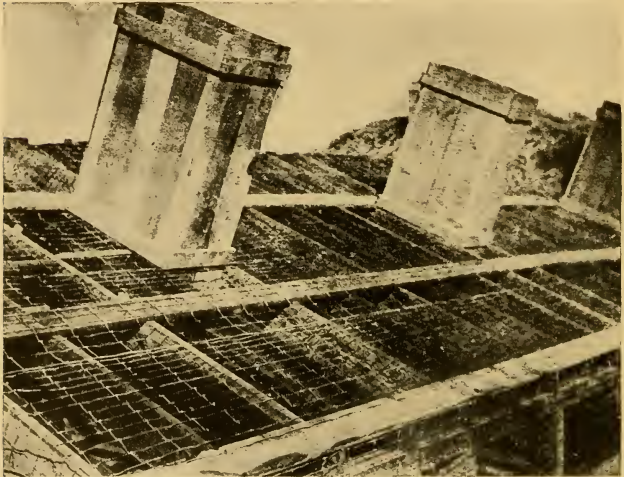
A storage house in process of construction at Aberdeen, Ida., showing side walls and roof covered with woven wire fencing and ventilators in side of roof.
